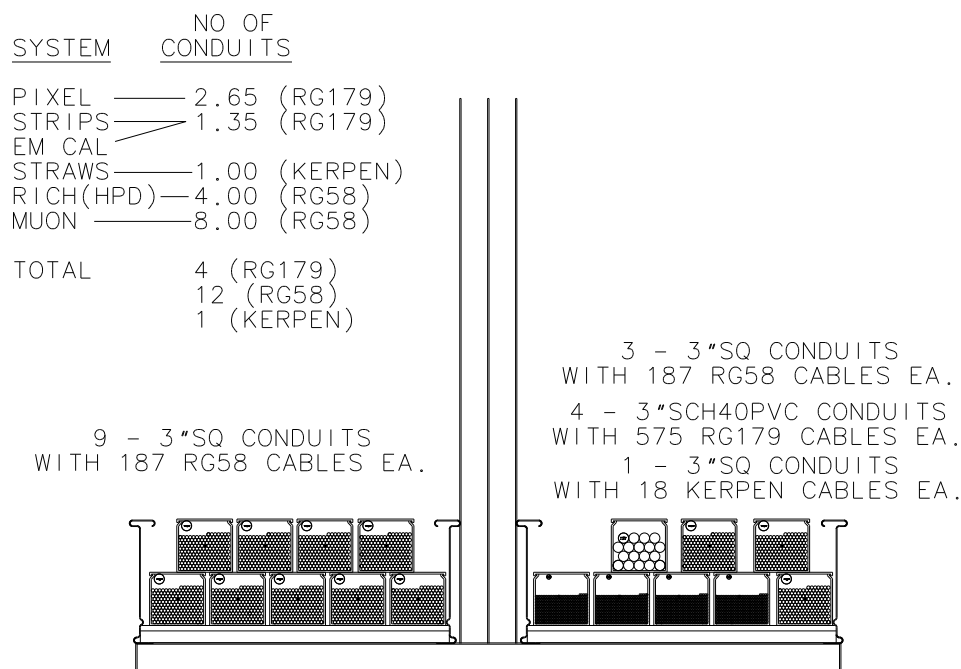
Layout of the HV cables in the collision hall cable trays.
